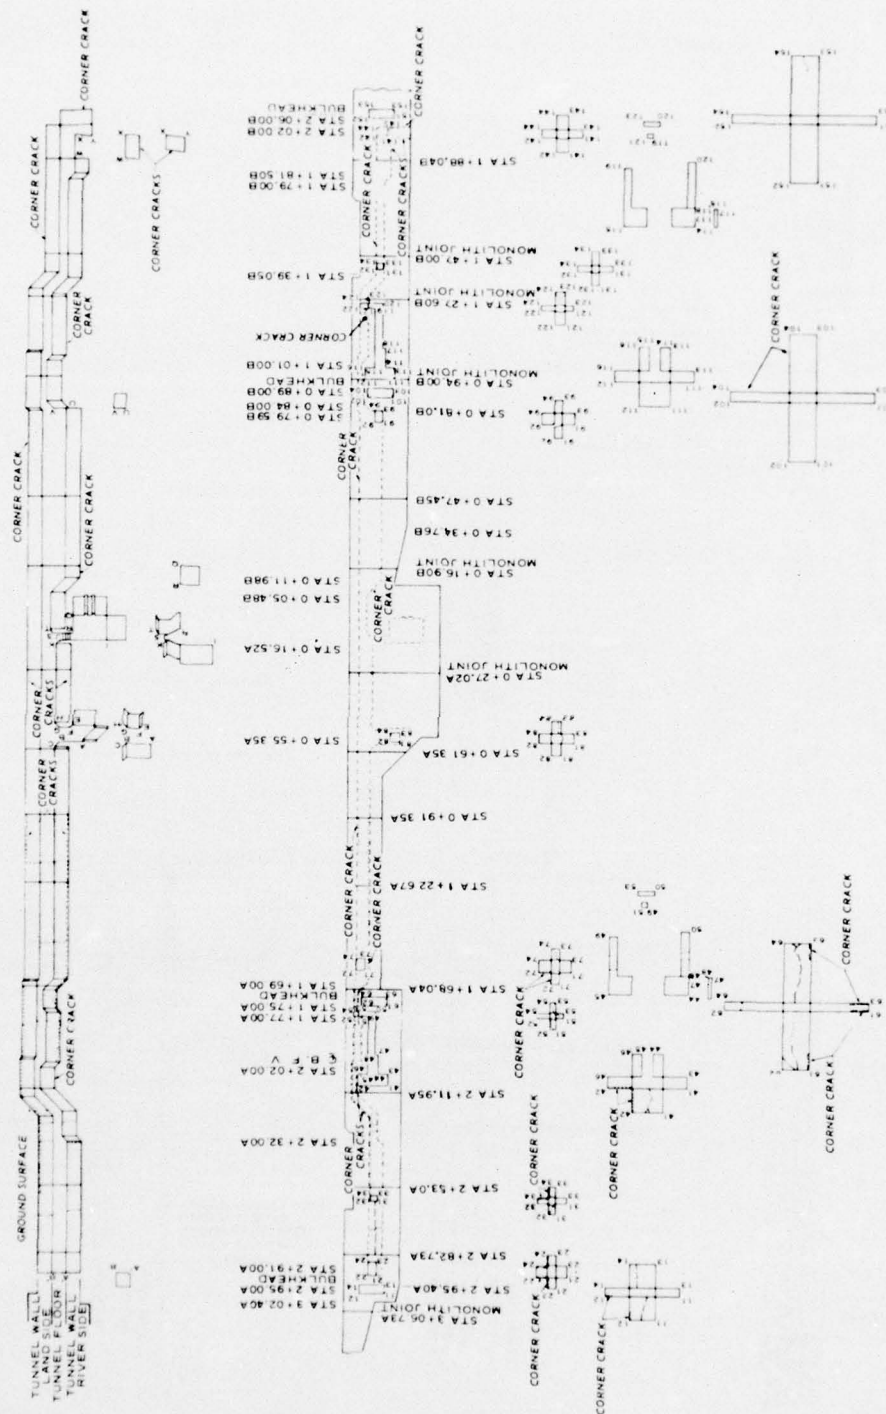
Crack survey, river wall, tunnels and shafts, Montgomery Locks and Dam, Ohio River.
